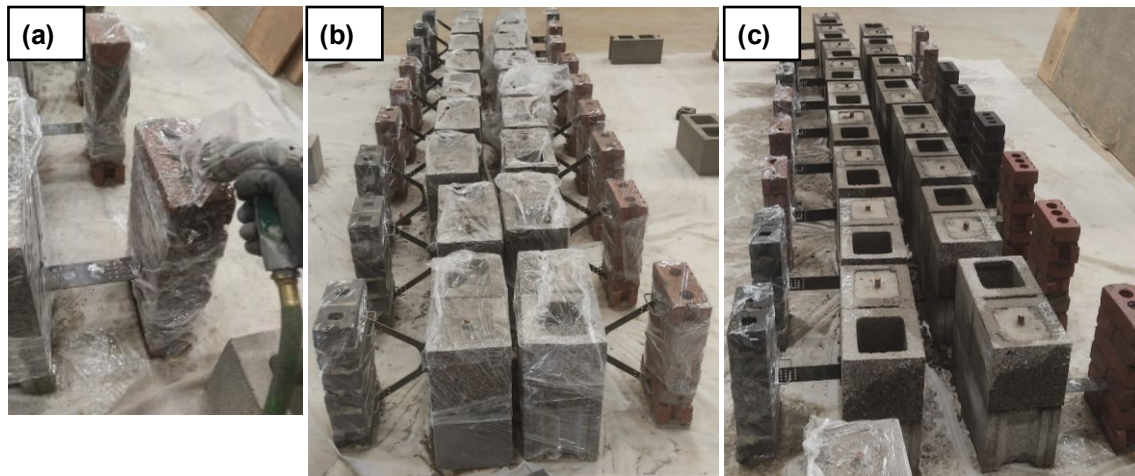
Specimen curing: a) spraying water on the veneer, b) specimens covered with polypropylene, and c) specimens after curing.
